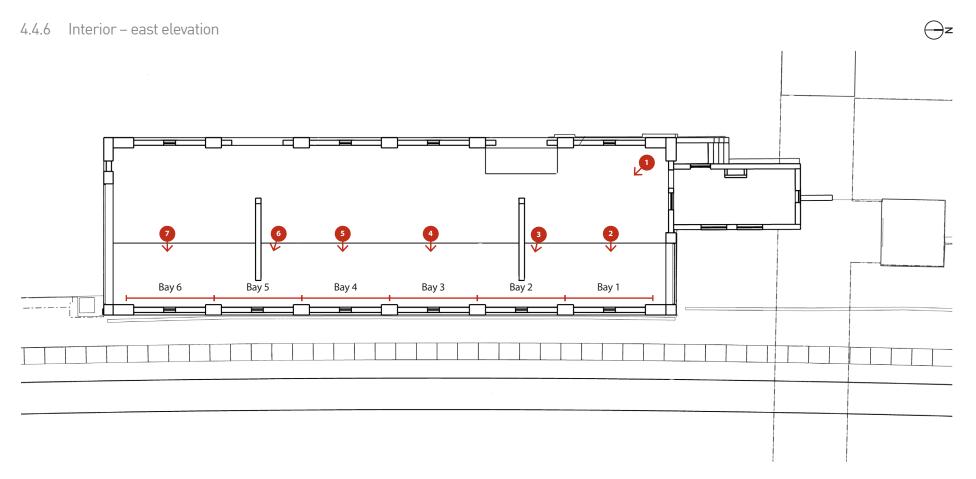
Key plan showing location and direction of photos of the interior east elevation of the Goods Shed
